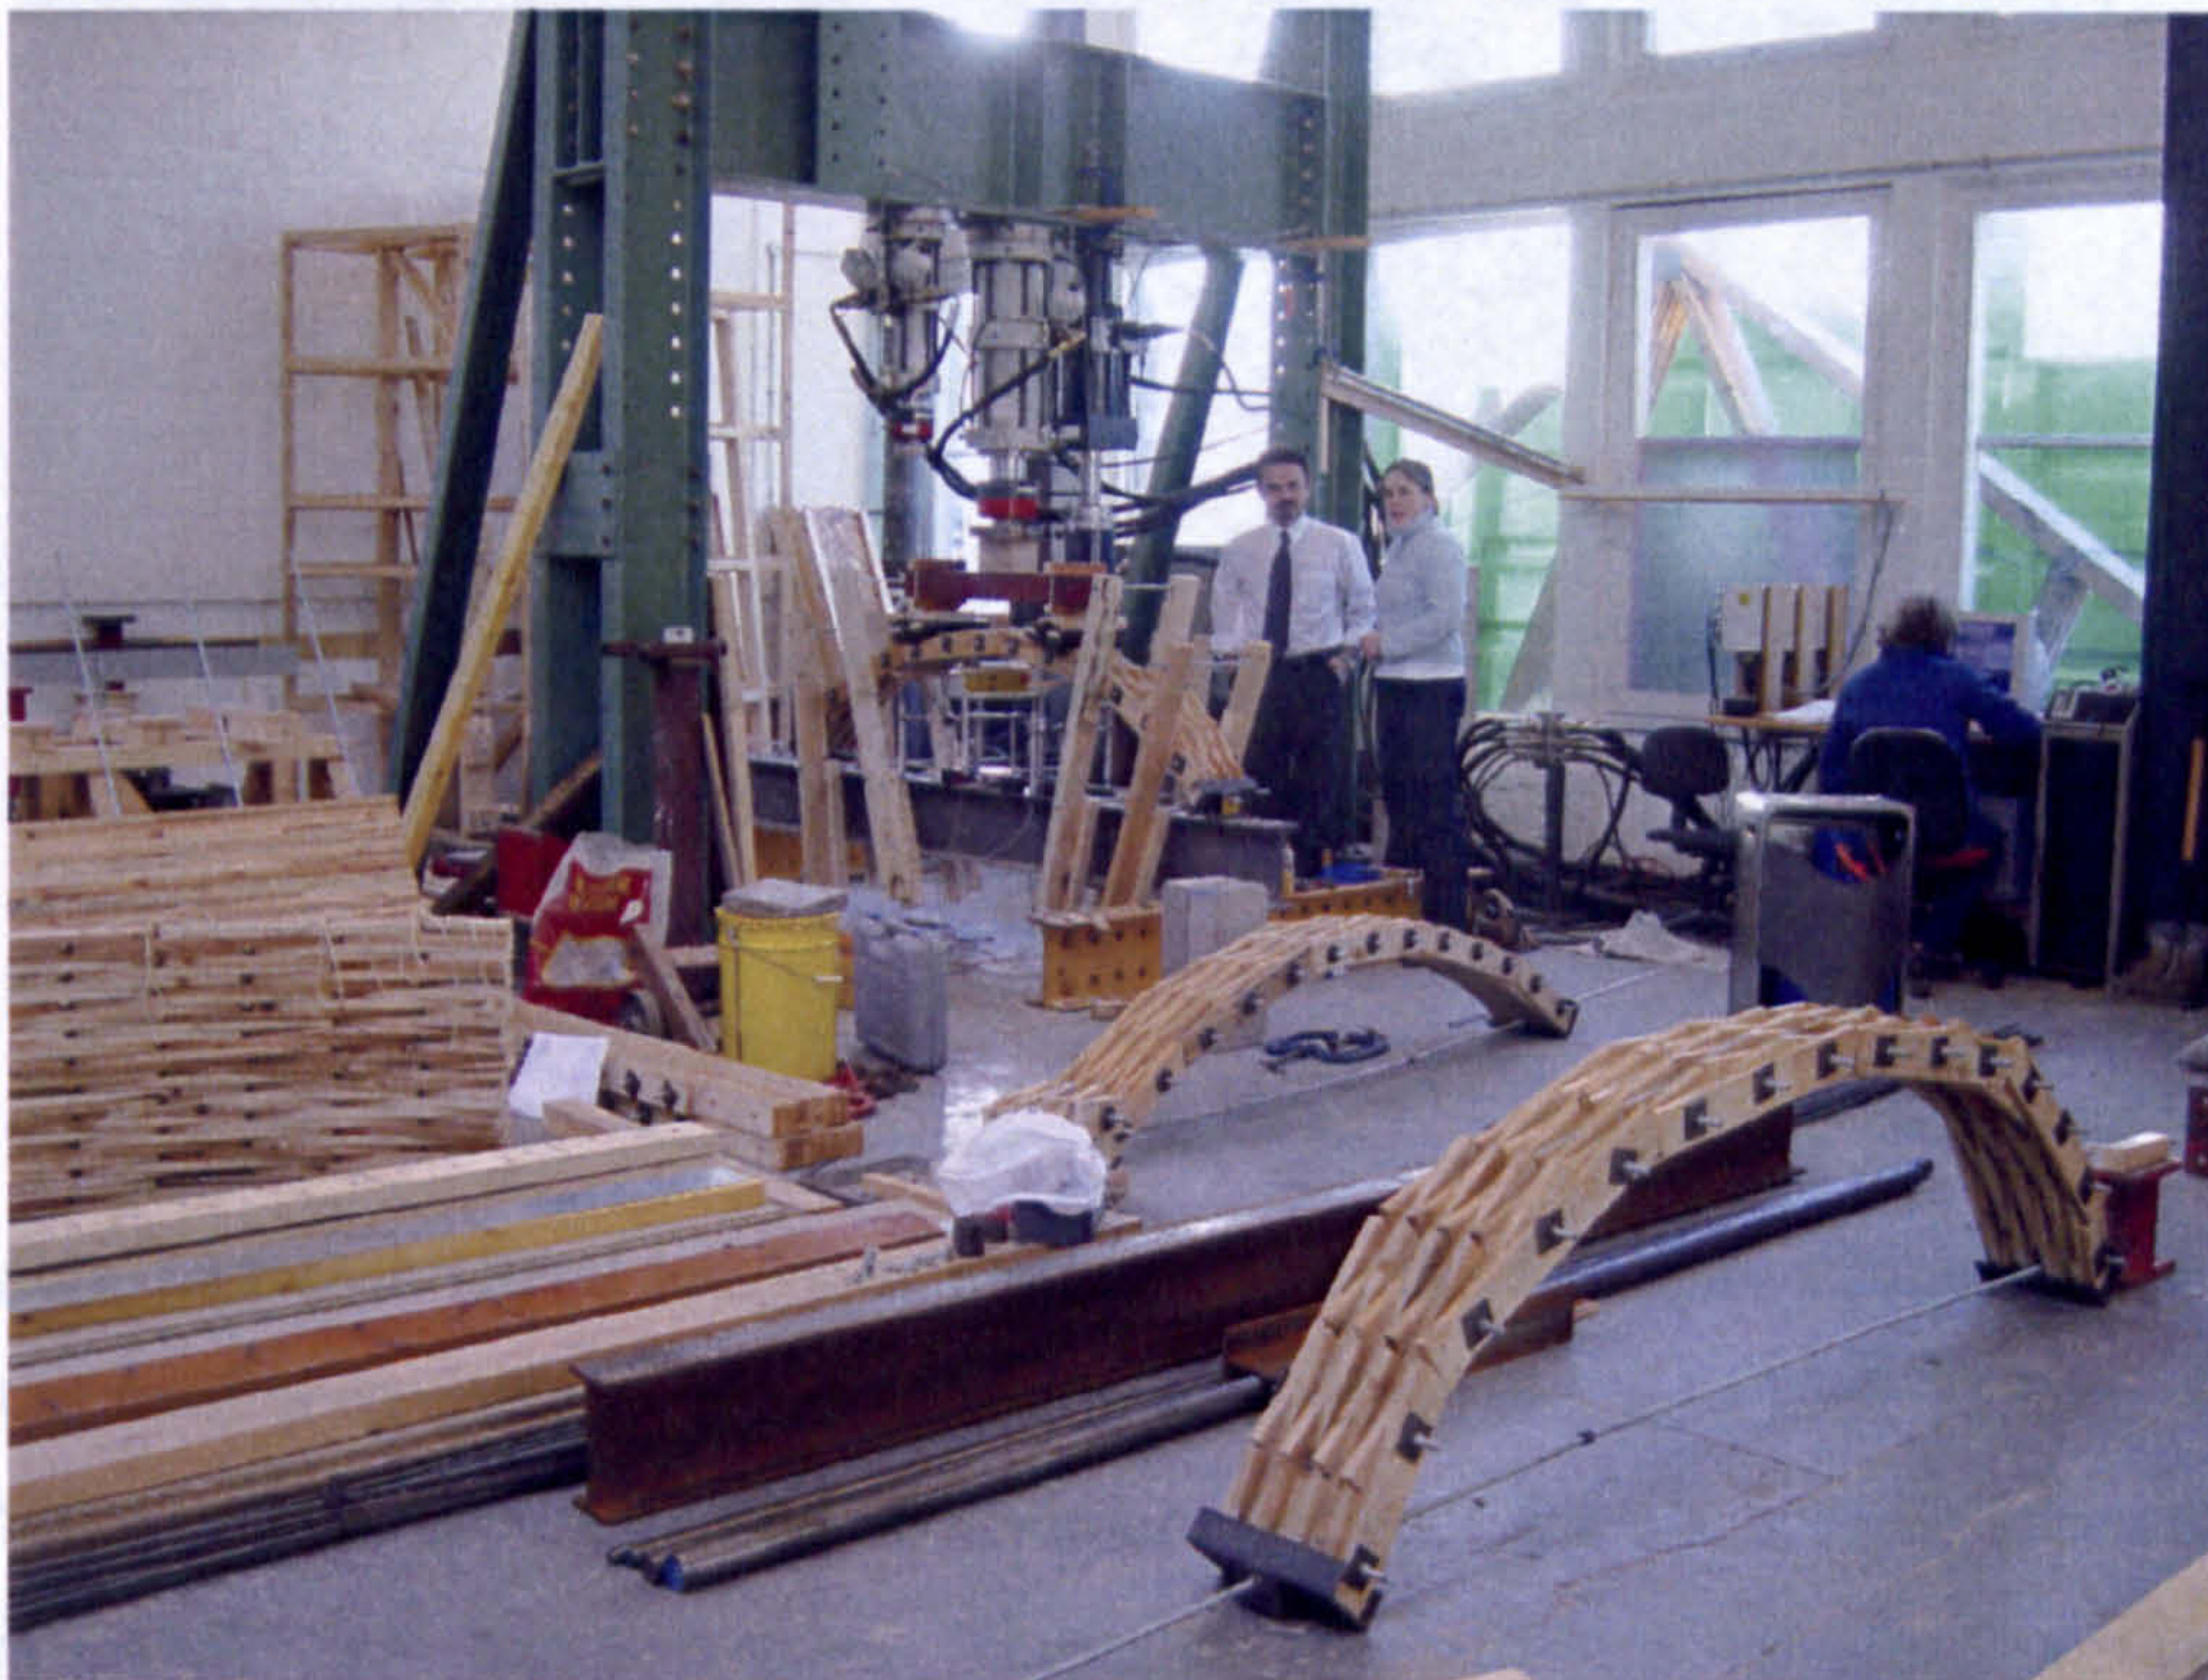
2.1m span – 580mm rise – 12.64kN tension
